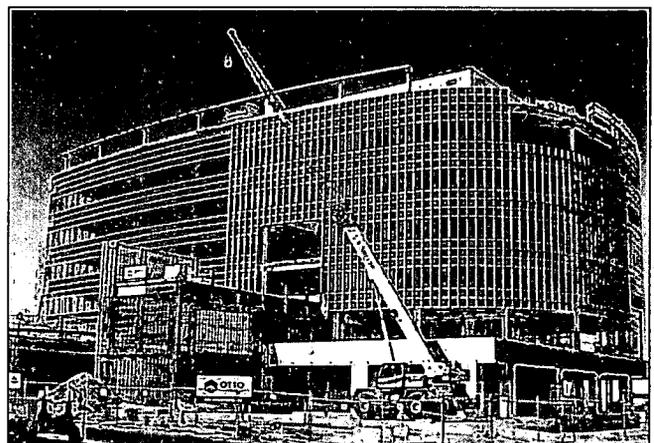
The new State Lottery Headquarters at North 10th Street and Vine Streets is the first expressive building form in the District and is the first high rise structure.
